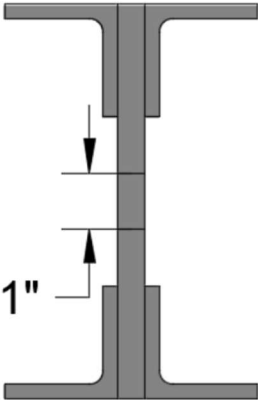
Cross-section view, conceptual secondary beam component design, built-up girder
